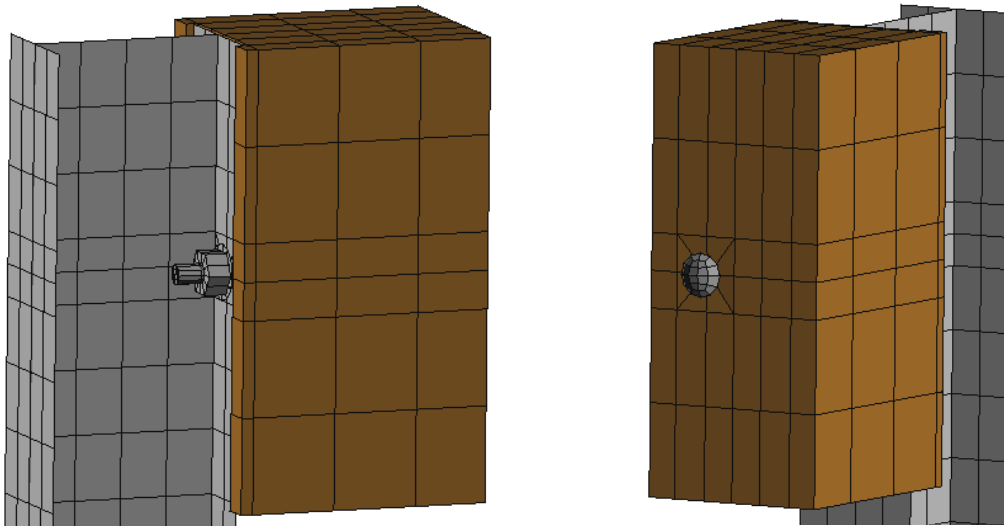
Finite Element Model of Routed Wooden Blockout Bolted to Steel Post.
